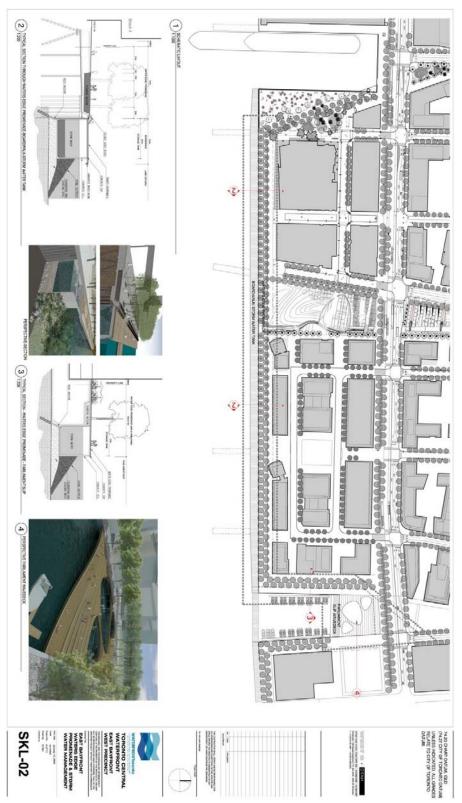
Waters Edge Promenade and Stormwater Management - Concept Drawing
